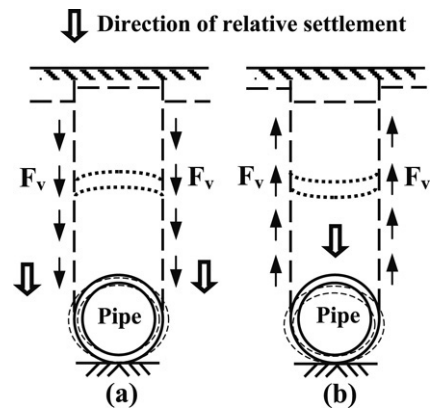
Pressure transfer within a soil–pipe system: (a) corrugated steel pipe in embankment installation and (b) corrugated PVC pipe in embankment installation (F_v = generated friction forces or shear stresses; interface condition = full-bonded).
